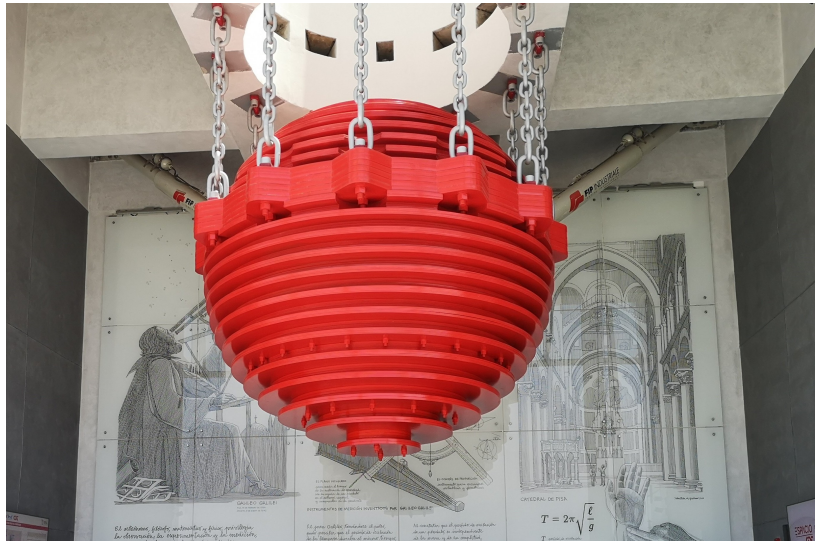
TMD installed in the Chilean Chamber of Construction building.
